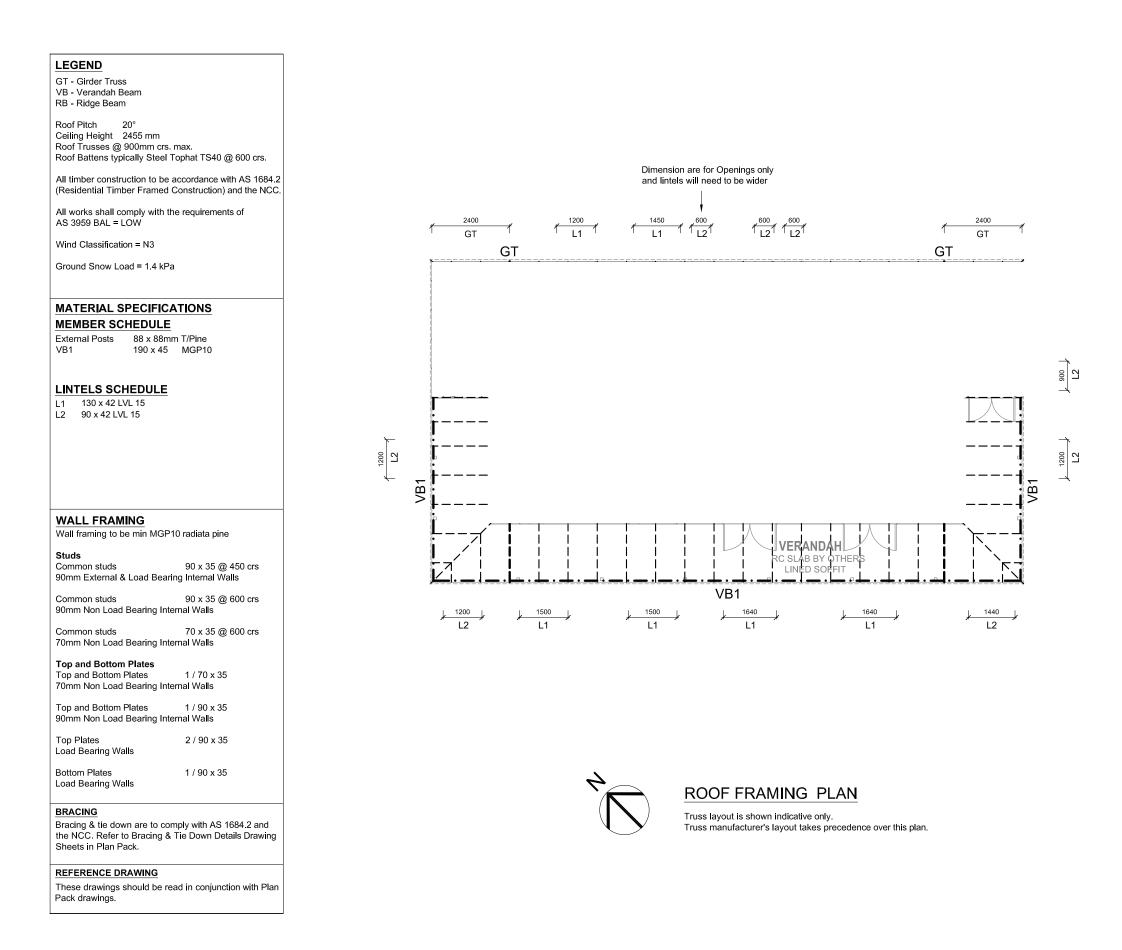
DETAILS OF BUILDING KIT (N21203) FOR EMMALIE STELLING 75 ROSSI DRIVE CLIFTON GROVE NSW 2800
